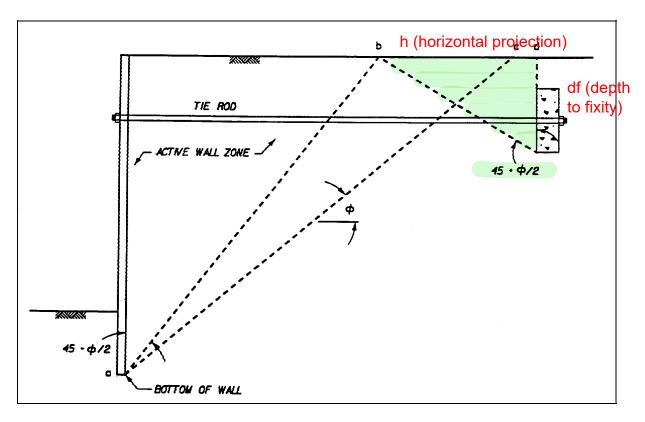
Minimum anchor - wall spacing for full passive anchor resistance in homogeneous soil
